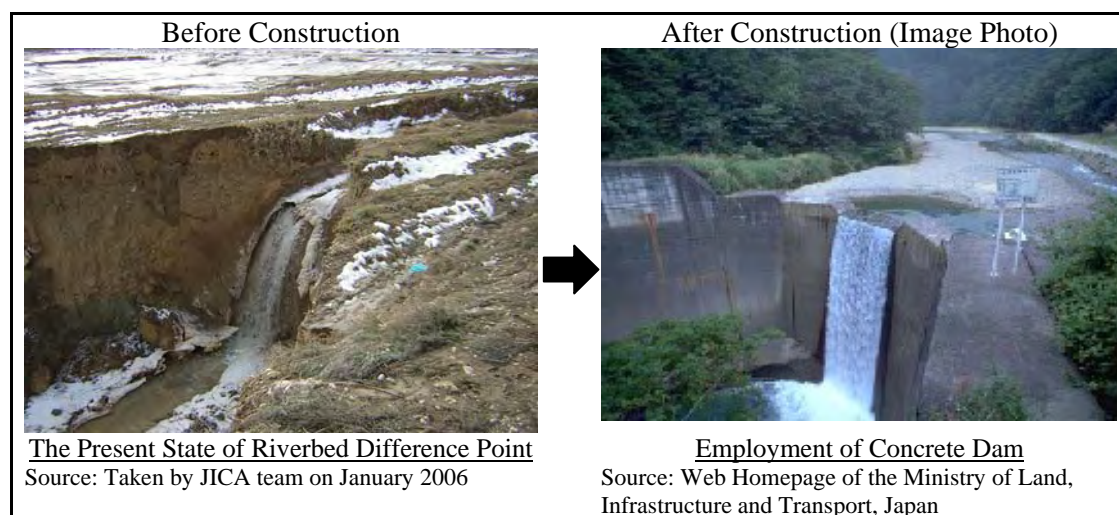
Image of the Proposed Riverbed Stabilization Works
